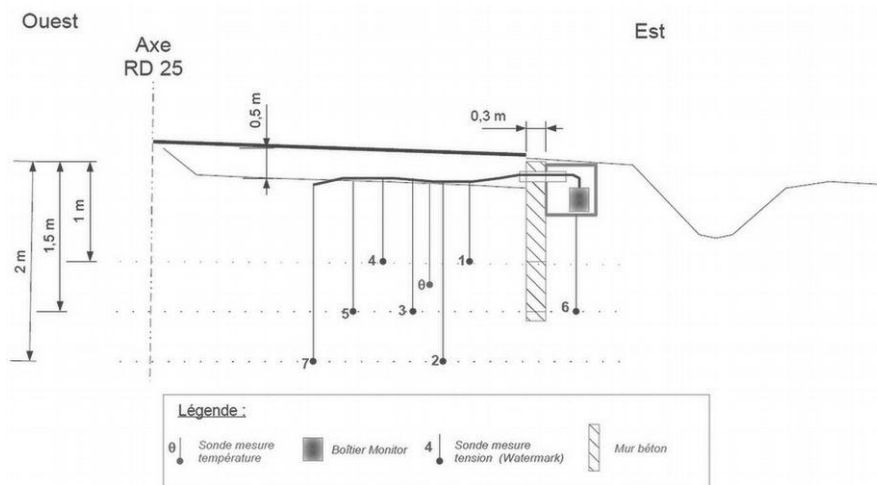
Diagram of probes implantation (depth of concrete wall varies according to the sections between 1 and 1.65 m)
